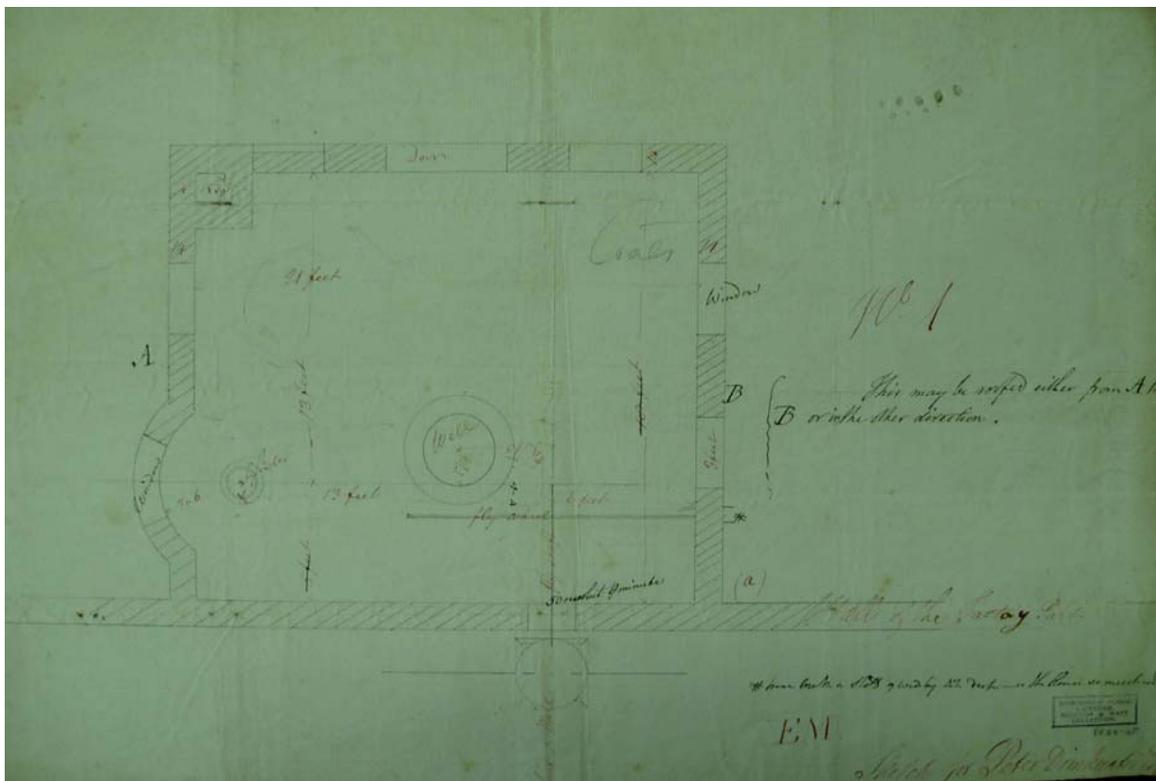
Sketch plan of proposal No 1 for engine house by Boulton and Watt, 1789
